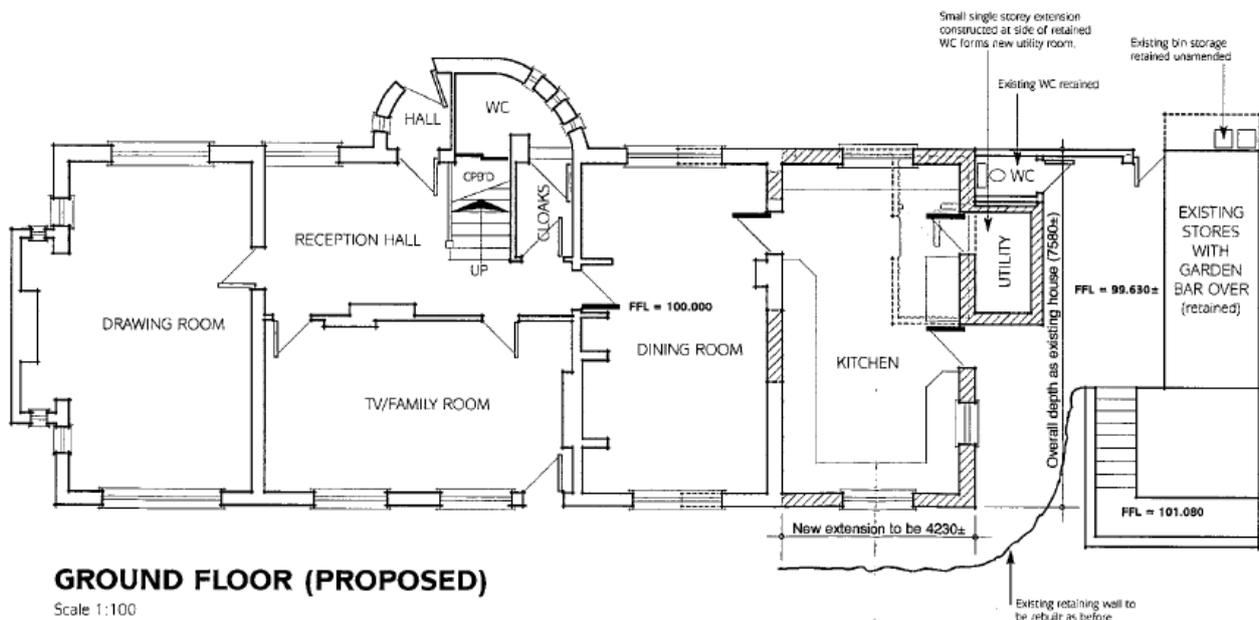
Proposed Ground Floor Plan from Extant Permission (4/00385/06/FHA)
